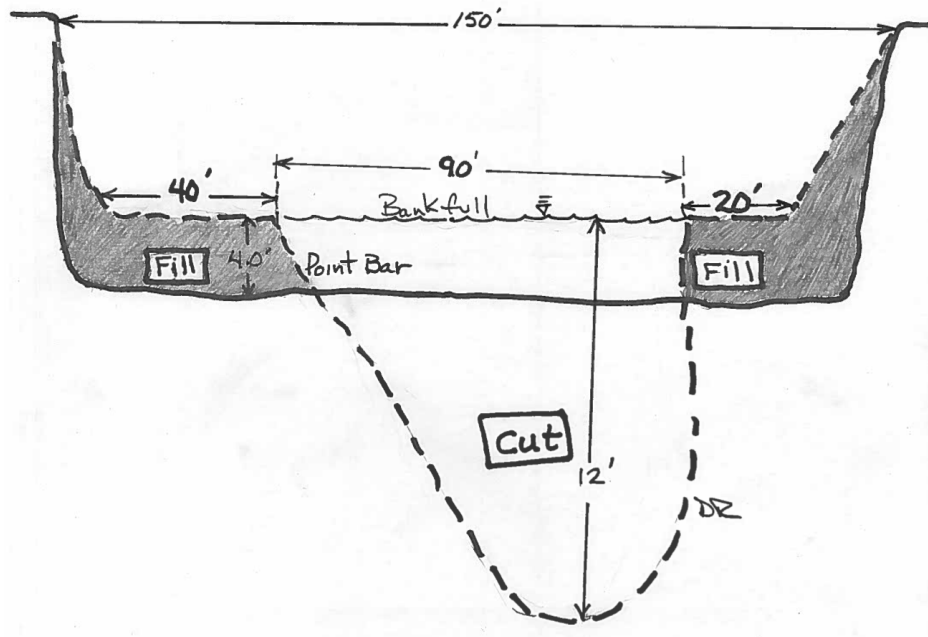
(lower) A typical pool cross-section showing point bar and maximum bankfull depth, floodplain construction and bankfull bench.
